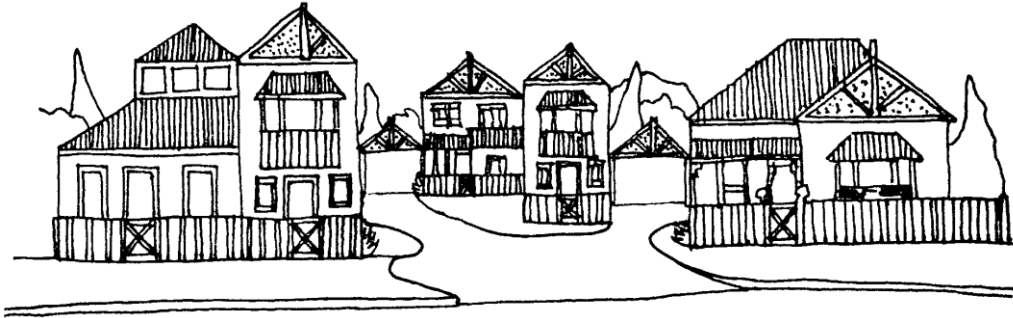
NEW DEVELOPMENT SHOULD ALWAYS ADDRESS THE STREET FRONTAGE
